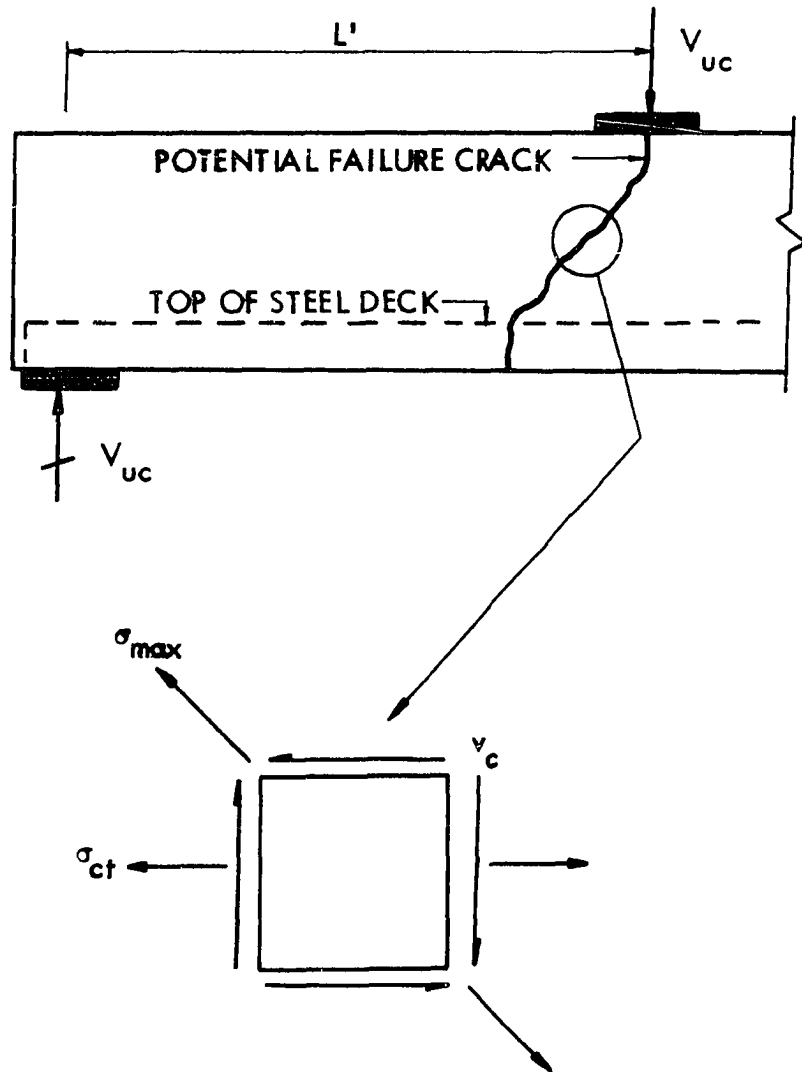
Forces at ultimate crack of typical shear-bond failure
